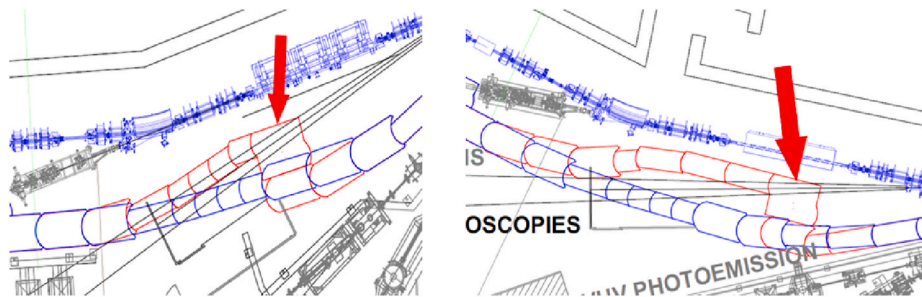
Outer wall reconfiguration for beam-exit 3.1 (left) and 4.1.
